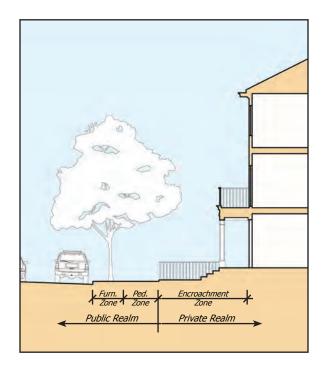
Cross Section, Dooryard Frontage (Illustrative)
